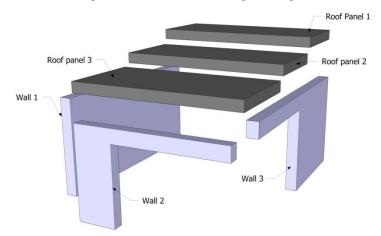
Exploded view of Trial 2 showing wall and roof panels
